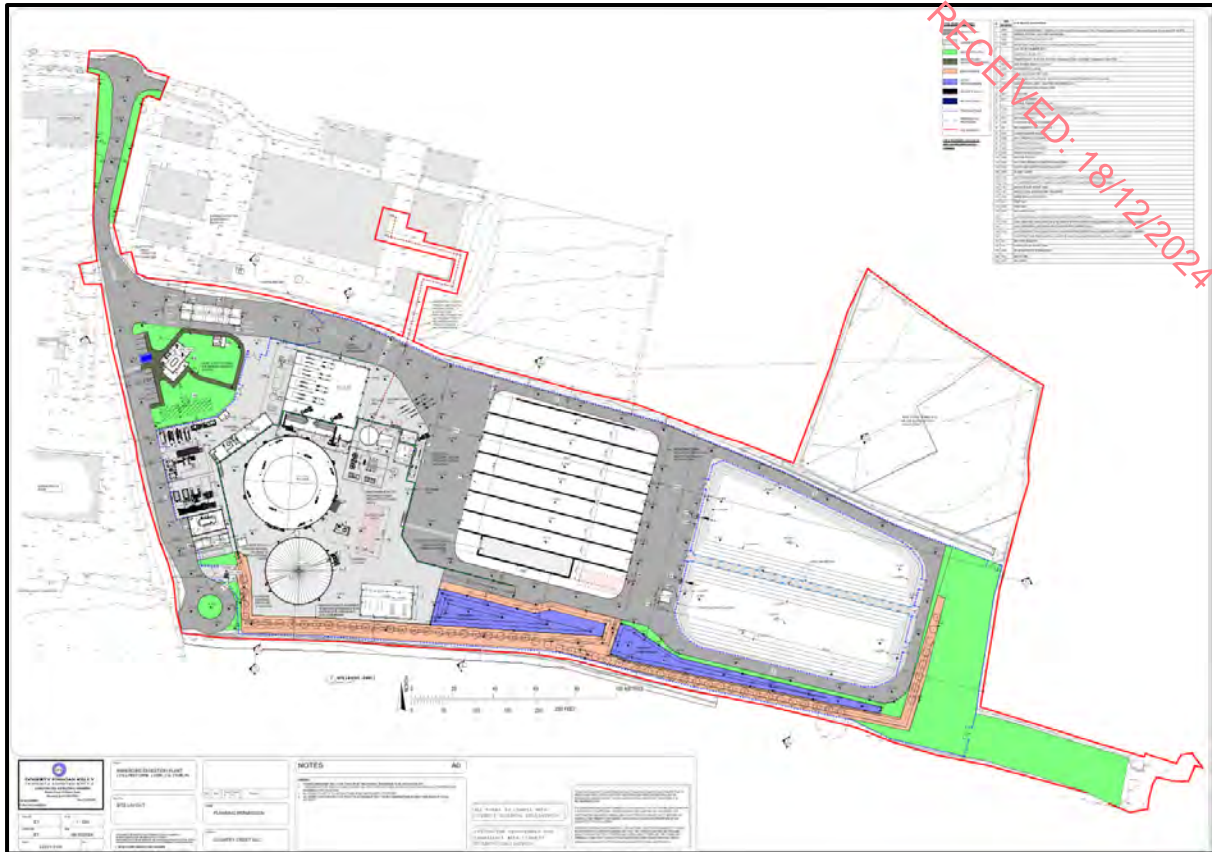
Proposed site layout plan (*site boundary in red*).
